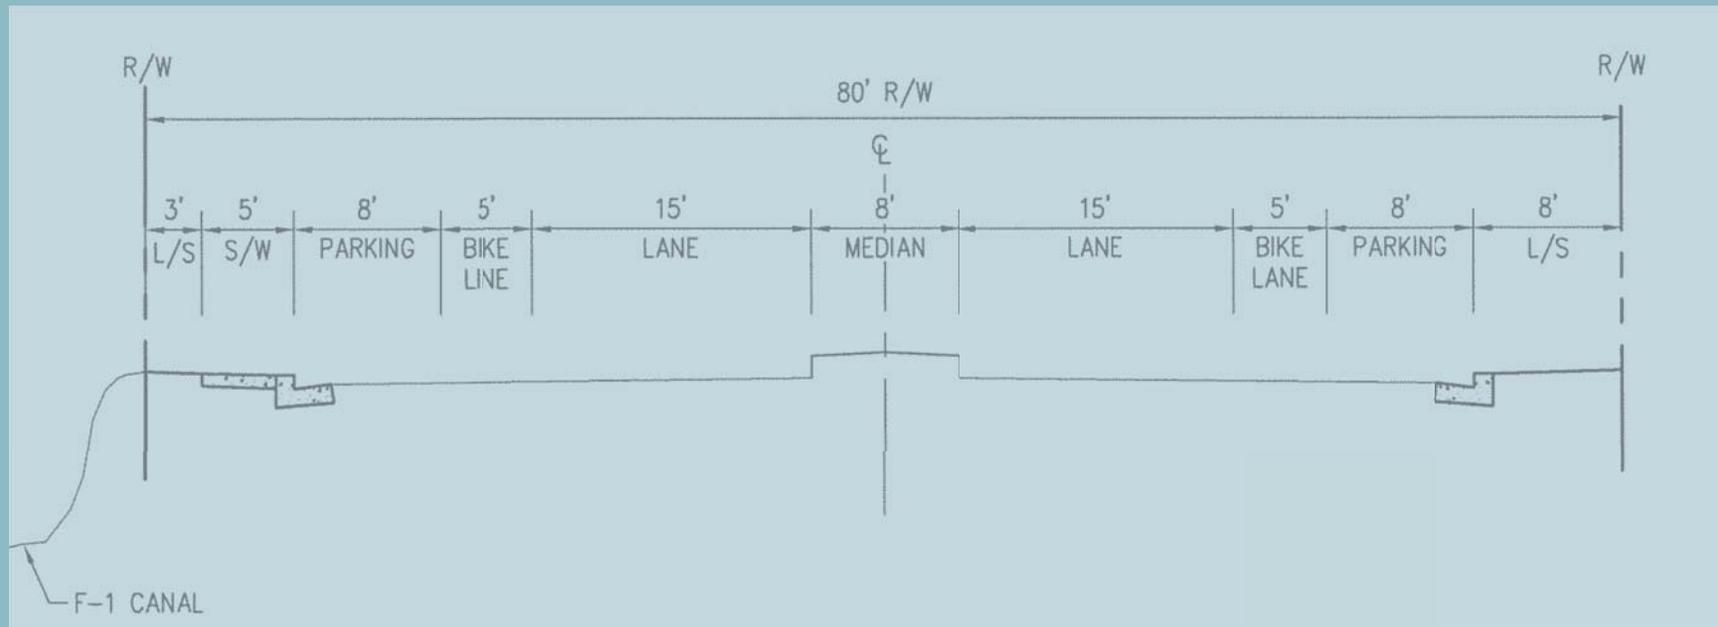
(c) - Willow Street (South of F-6 Ditch)
